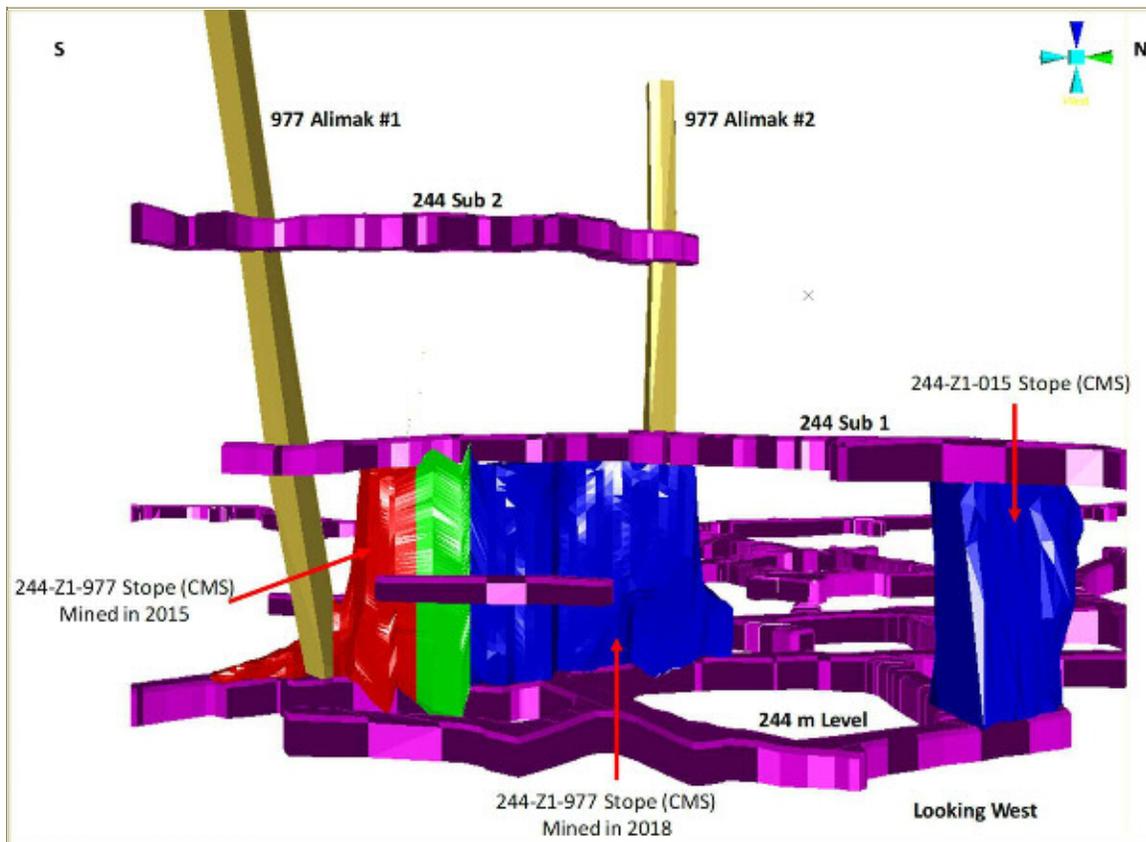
244-Z1-977 Test Stope – Looking West (Source: Rubicon, 2019)
